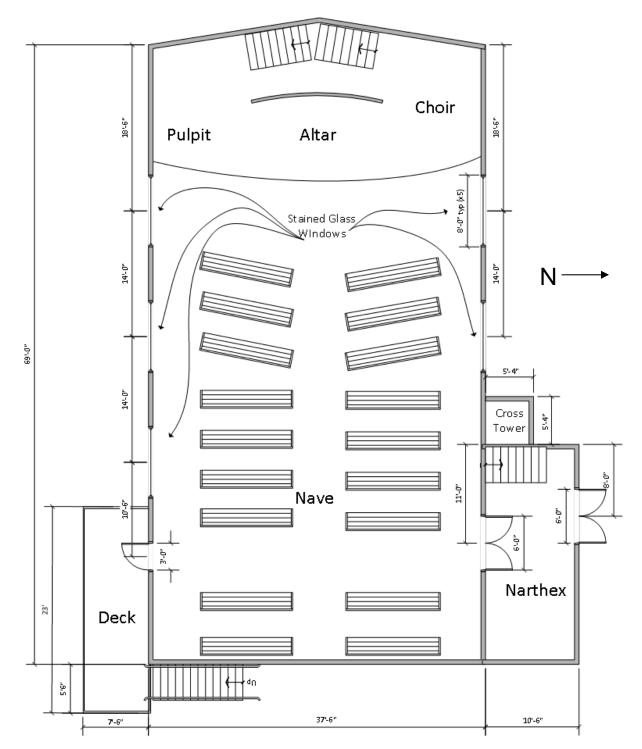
Floor Plan sketch of 1940 Log Church (original)
